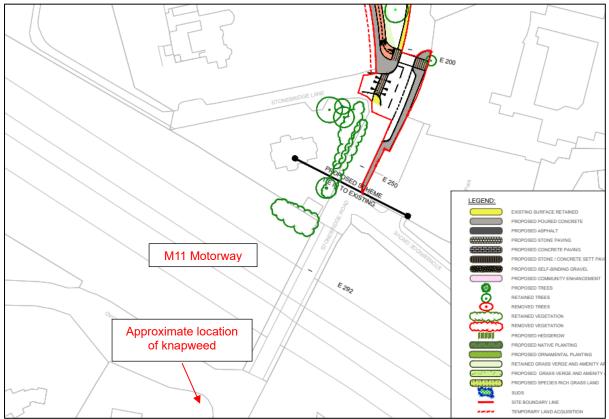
Extract of Landscape General Arrangement drawings (Sheet 53) showing the approximate location described in the submission
